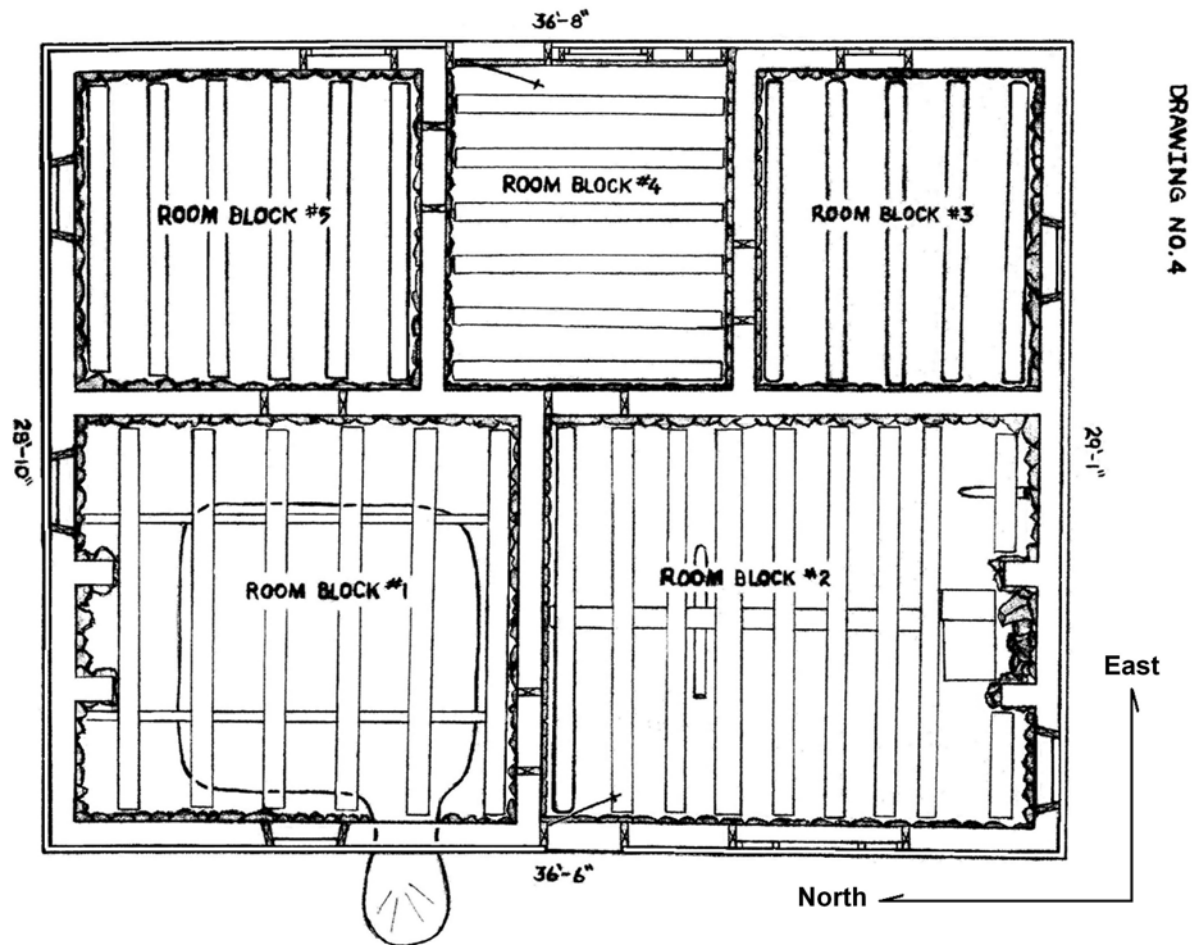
Floor plan showing the stone foundation and log floor superstructure alignment.
